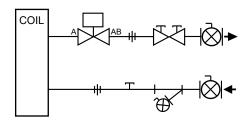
Deluxe 3-Way Valve Package (Auto CS)
